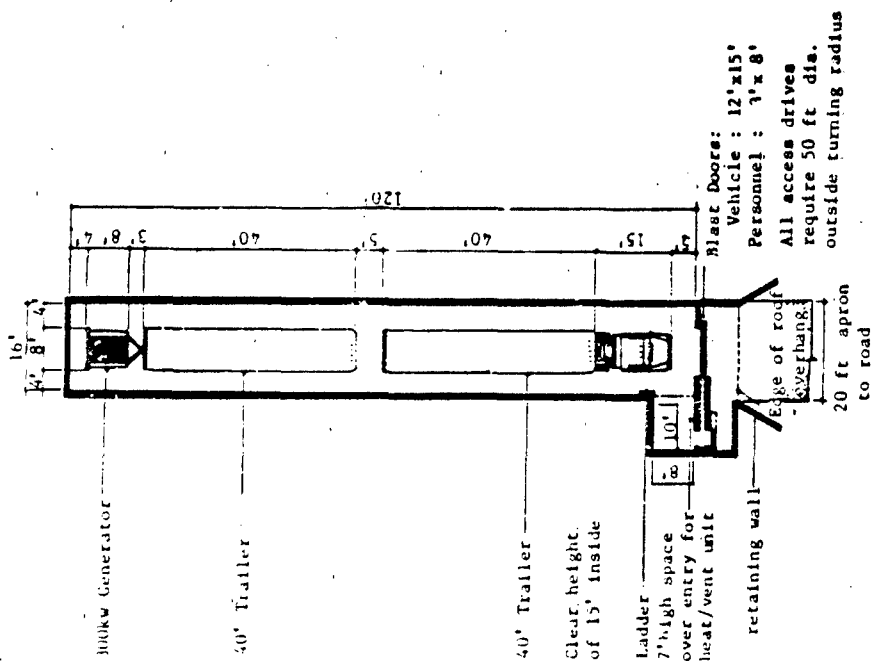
FLOOR PLAN--TRANSPORTABLE UNIT STORAGE SHELTER.
